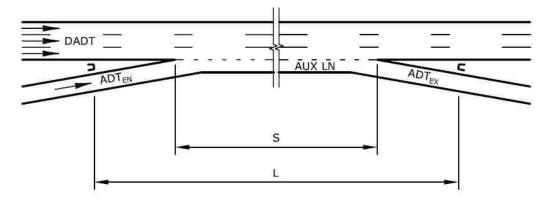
Typical Layout and Variables for the EN-EX Ramp Spacing Combination
